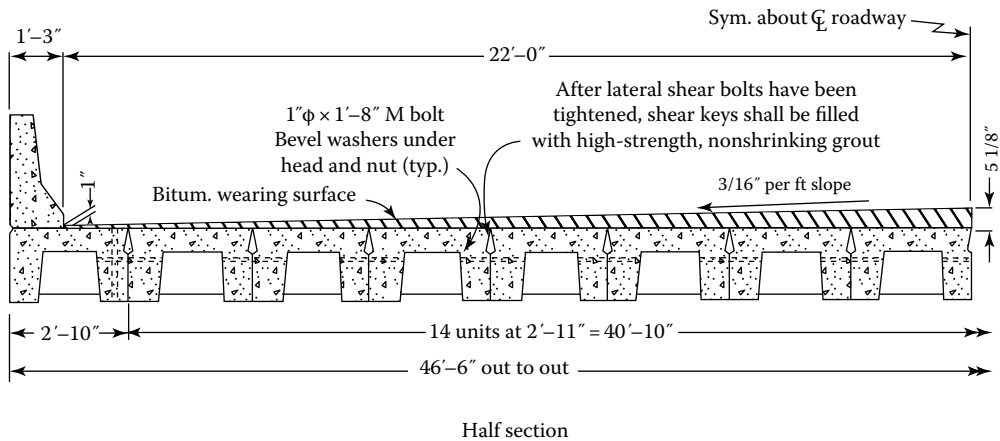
Superstructure system Type *h*: precast concrete channel sections with shear keys and concrete overlay. (Notes: cross-sectional dimensions shown are for illustrative purposes only and may vary depending on the number of design lanes. Fill dowel sleeves with grout at fixed end and bitumen at exp. end.)
